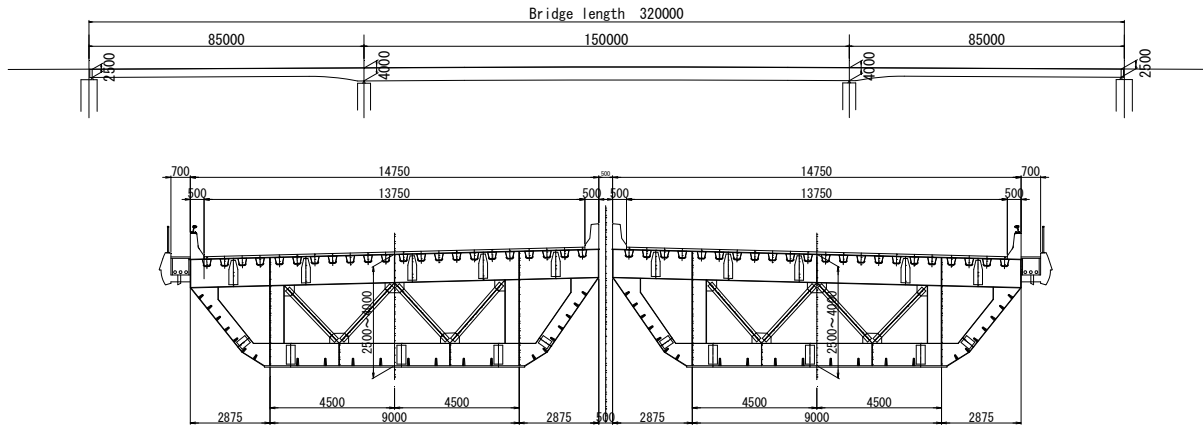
Profile and Cross Section of Superstructure on Land Section for General Section (PC box Girder)
